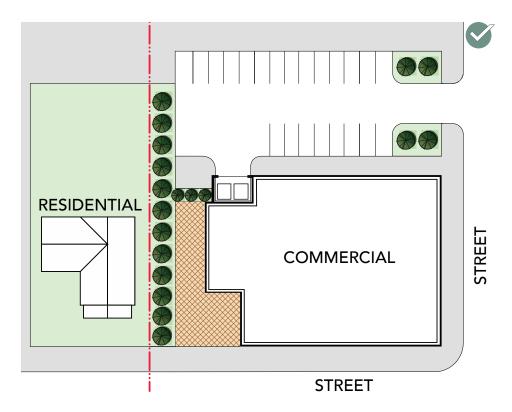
Design a commercial or mixed-use building to be compatible with a neighboring residential site. For example, trash storage should be located away from the street and towards the interior of the site, and landscaping and open space can help present a softer edge to the residential site.
